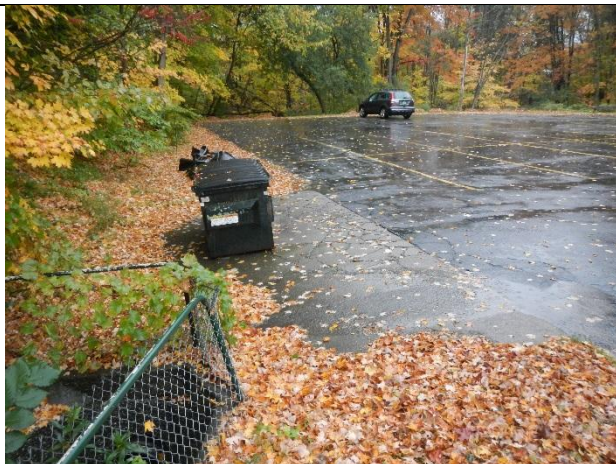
Tributary flowing under parking lot to outlet at southwest corner (near car)
